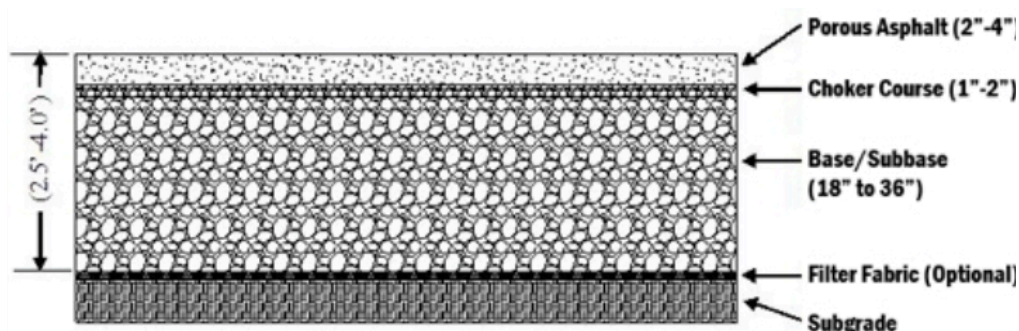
Cross Section of the Porous Asphalt Pavement (US EPA)
